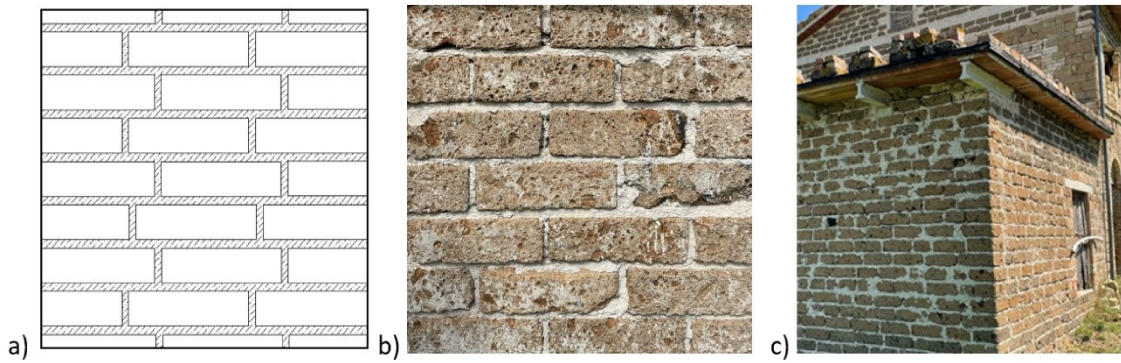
Regular soft stone masonry (M5) – a) Graphic reconstruction of the wall texture type (1m x 1m); b) Wall façade example, photo taken in Treia (MC); c) Typical tuff masonry building example, photo taken in San Ginesio (MC).
